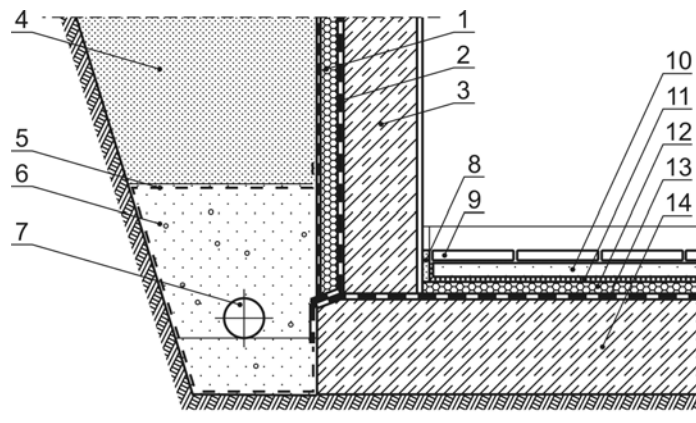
The example of application of isolation-drainaging membranes [34]: 1 - isolation-drainaging membrane; 2 - proper isolation against water; 3 - reinforced concrete slab; 4 - fill-up ground; 5 - geofibre; 6 - gravel; 7 - drainage pipe; 8 - pedestal beading; 9 - floor finish; 10 - concrete foundation; 11 - protective layer; 12 - thermal isolation; 13 - isolation against water; 14 - reinforced concrete slab.
